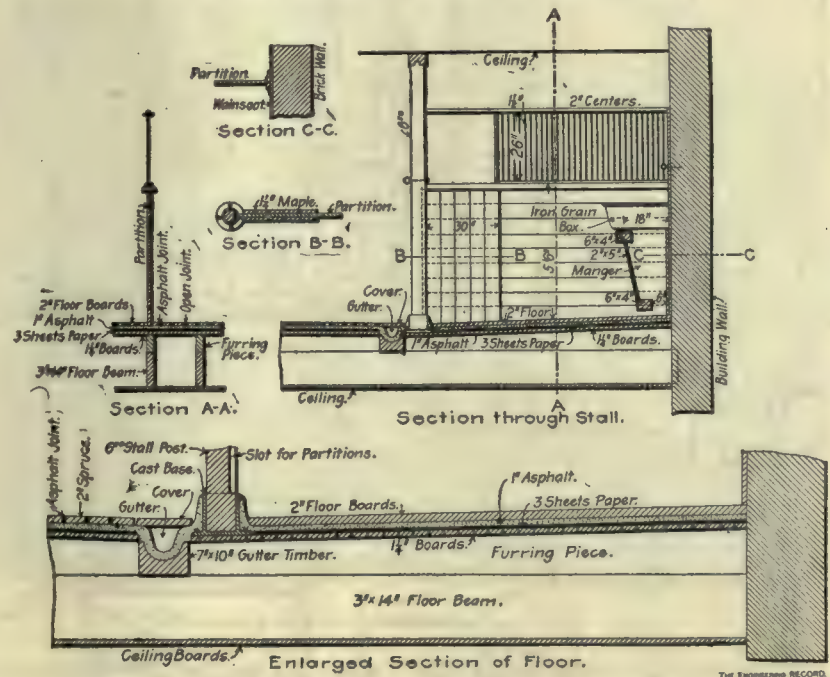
DETAILS OF STALLS IN NEW STABLES.
